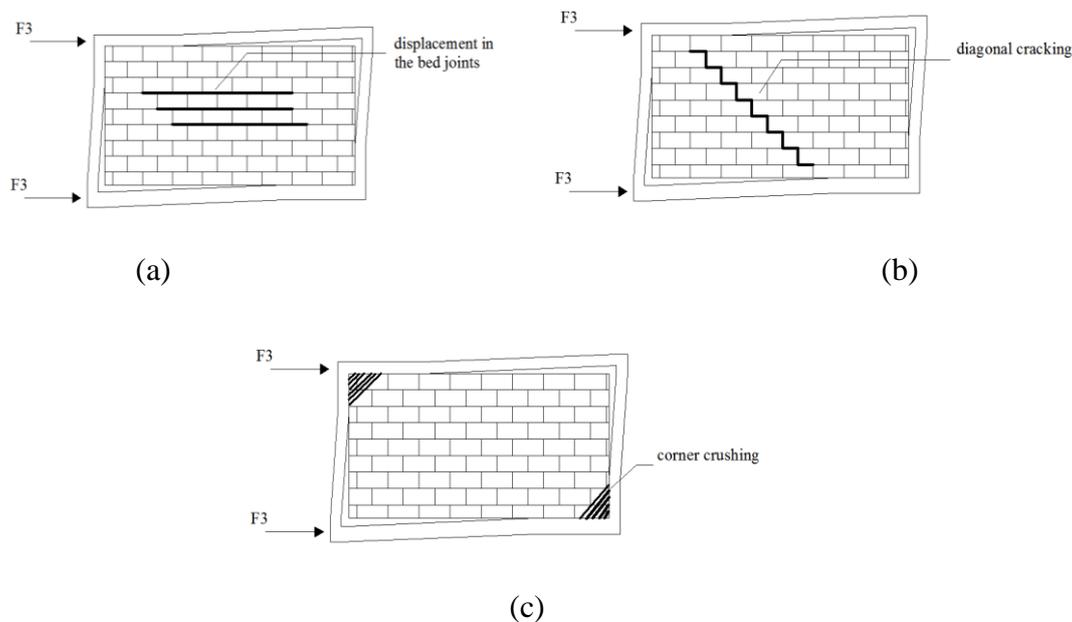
Possible damage mechanisms of the infill walls in stage 3: (a) displacement of the bed joints (horizontal cracking); (b) diagonal cracking; (c) corner crushing.
